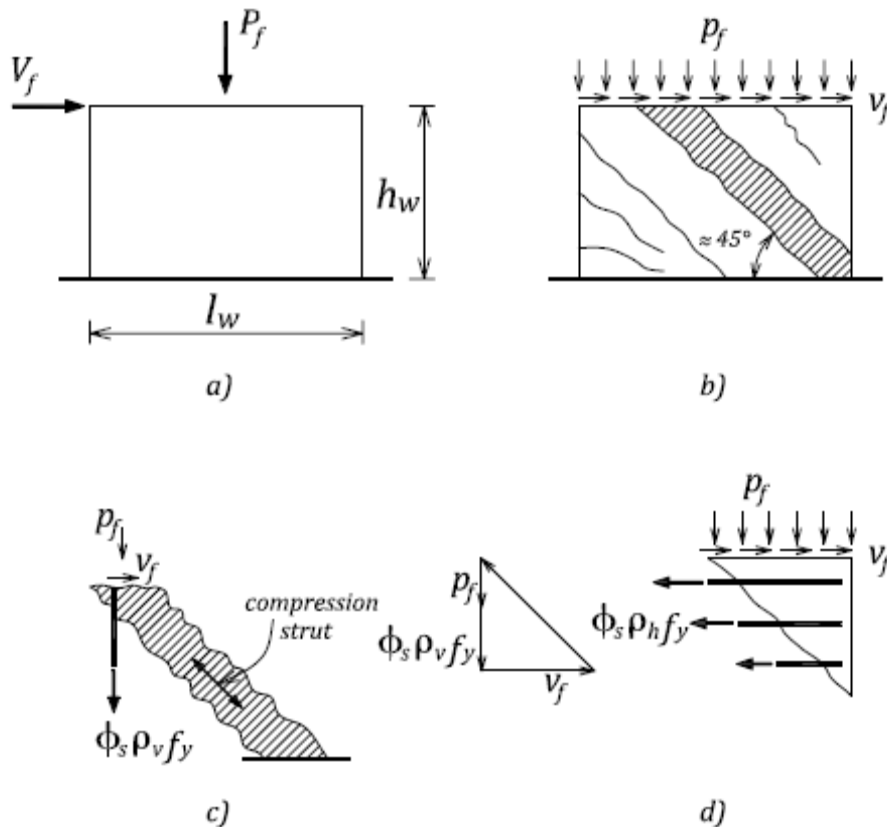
Shear failure mechanism for a squat shear wall: a) wall subjected to shear and axial load; b) crack pattern; c) compression strut; d) free-body diagram.
